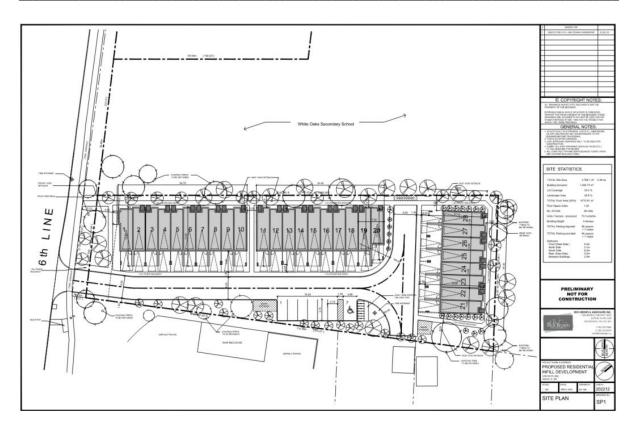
Concept Plan for Townhouse Dwelling Units, dated May 20, 2025
